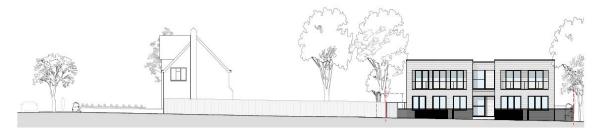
Front Elevation of the proposed development and flank elevation of the host property, 59 Rectory Park
